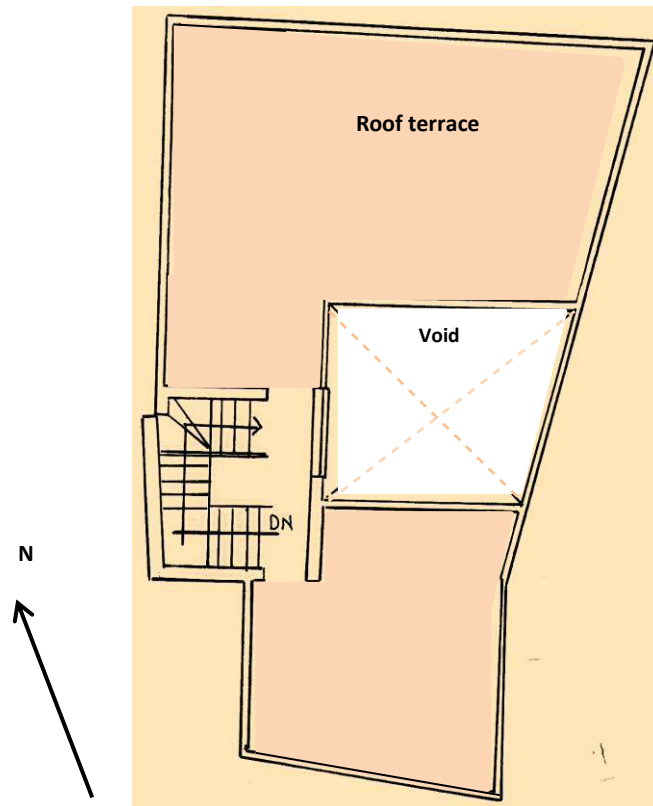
Roof terrace level plan of modern house No. 3. Scale: 1:100 (Researcher)
